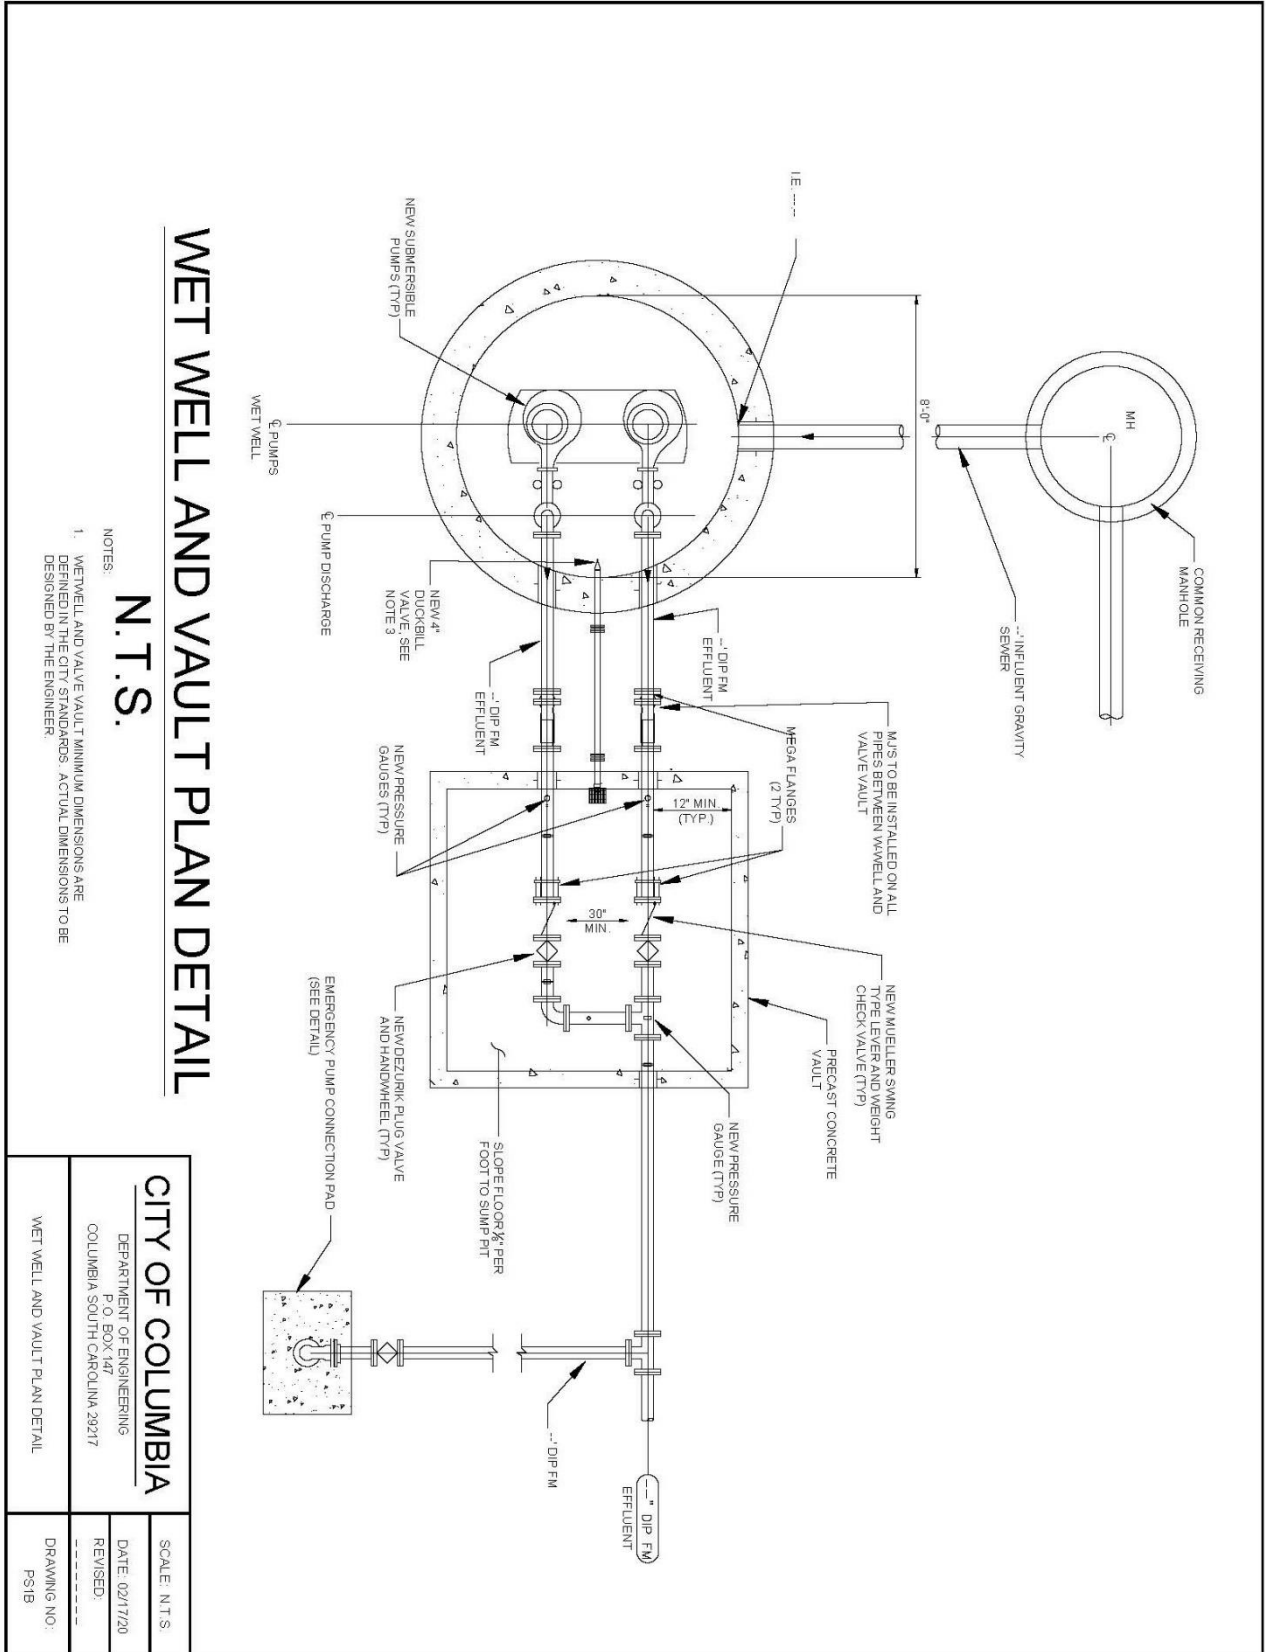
PS1B - Wet Well and Vault Plan Detail
